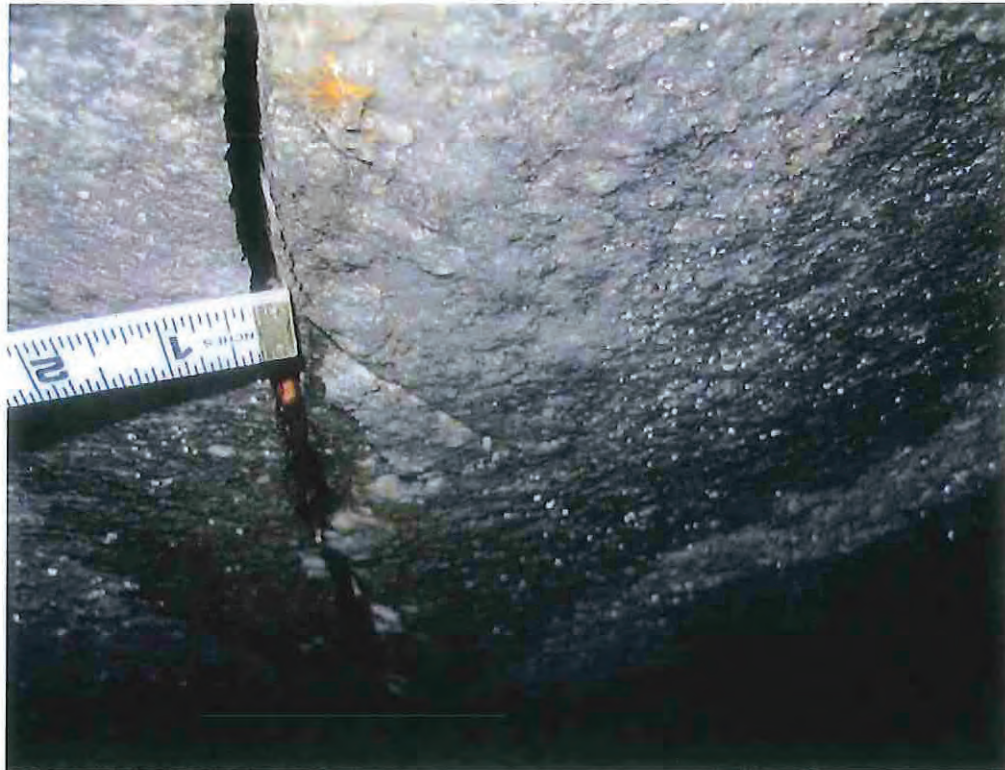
Span 2 (North Span) 7th granite slab from the east-1/4" wide full width x full height crack at midspan, west edge.
